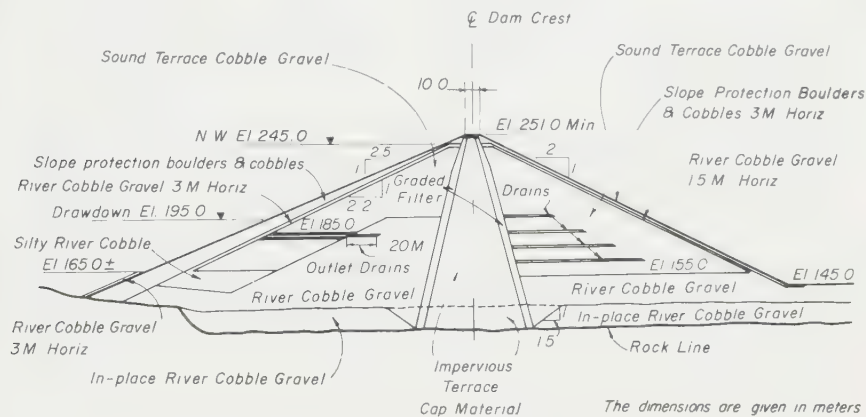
Cross section of Shihmen Dam, Taiwan.
